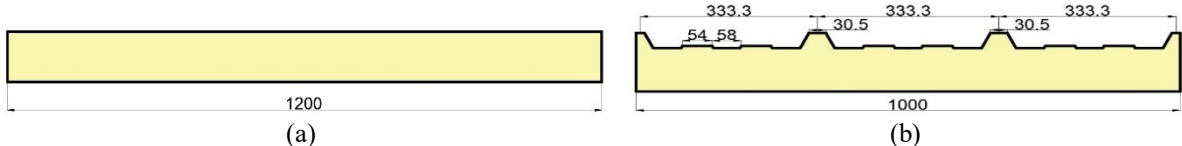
The cross-section of sandwich panels in bending tests, a) MW panels, b) PIR panels, dimensions in mm
